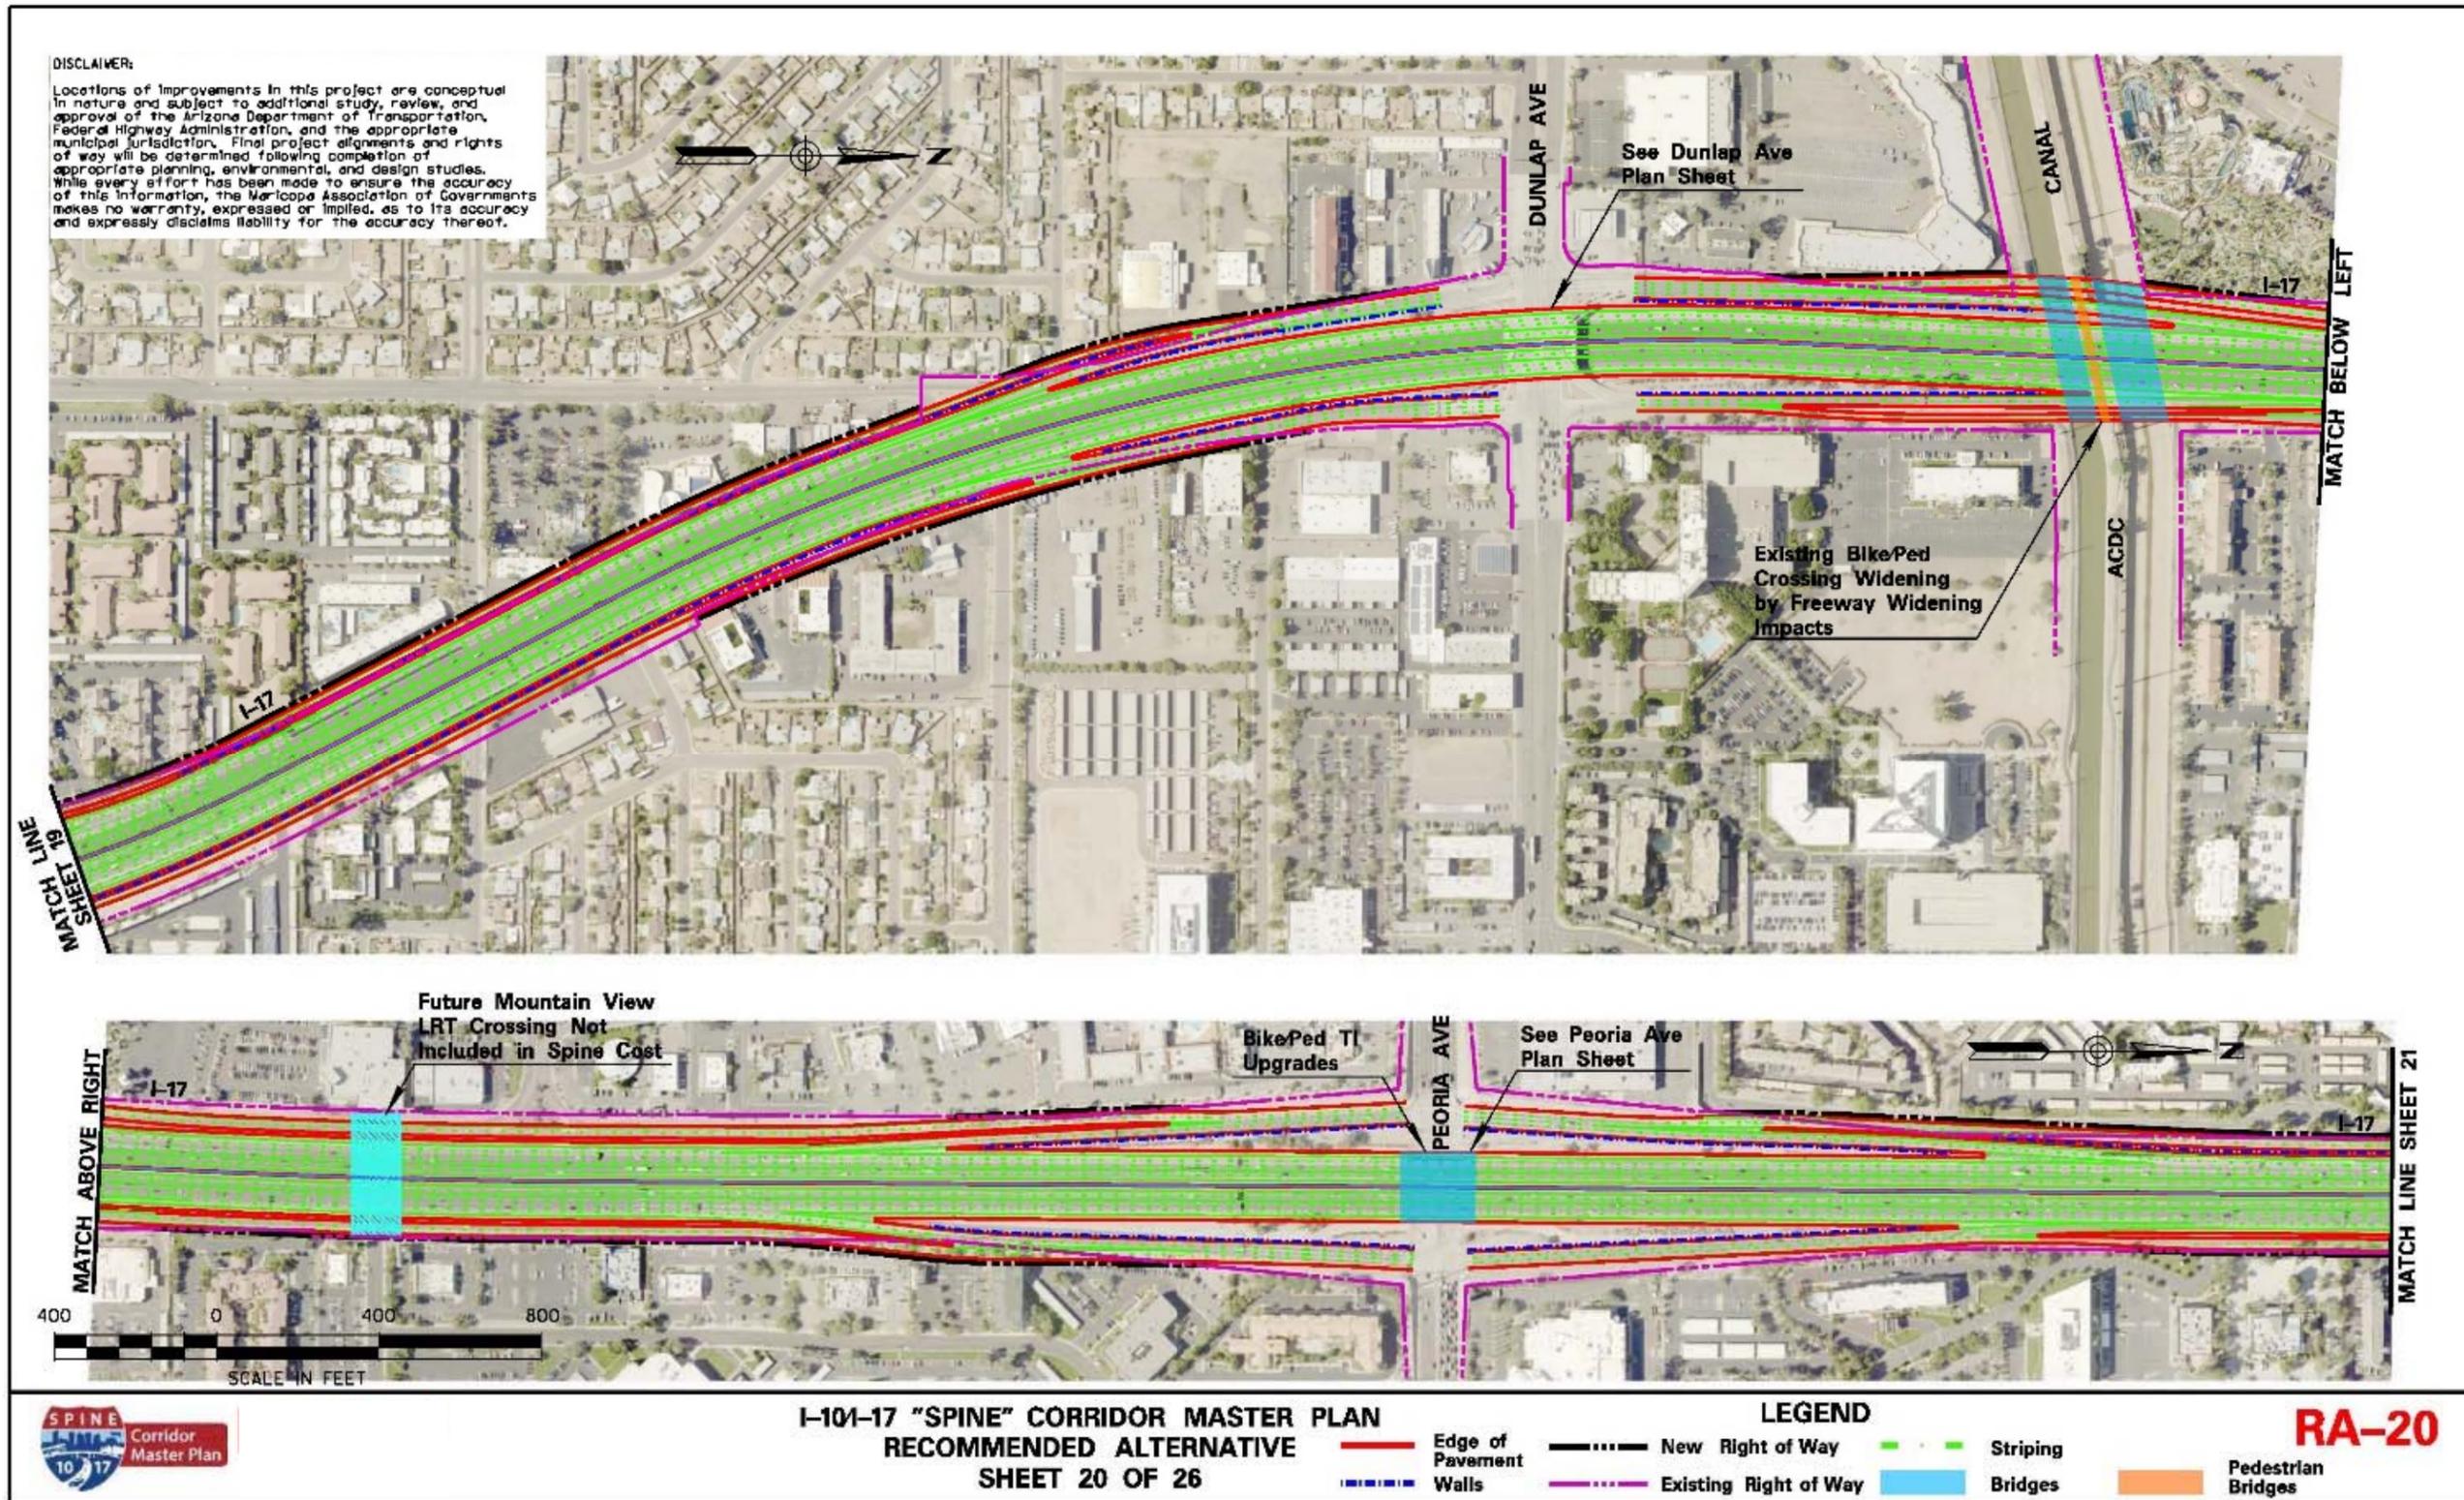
Recommended Alternative, Sheet 20 of 26 (I-17 Segment: I-10 Stack to Dunlap Avenue)
